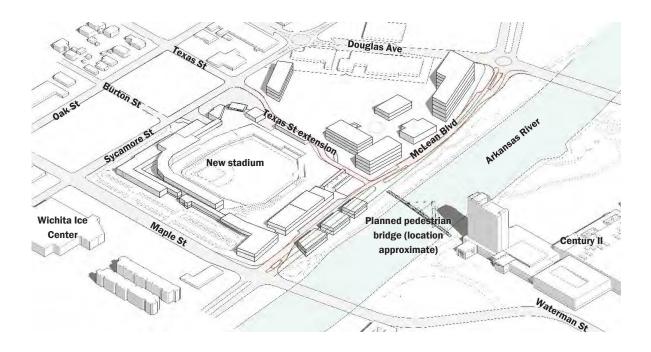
Street network changes consist of a reconstruction of McLean Boulevard, and extension of Texas Street to meet McLean and the planned pedestrian bridge across the Arkansas River. The diagram above illustrates a possible alignment for the Texas Street extension. The extension curves so it can be entirely located on the stadium site. Solid red lines indicate new alignments; solid green lines indicate the existing McLean Boulevard alignment.
